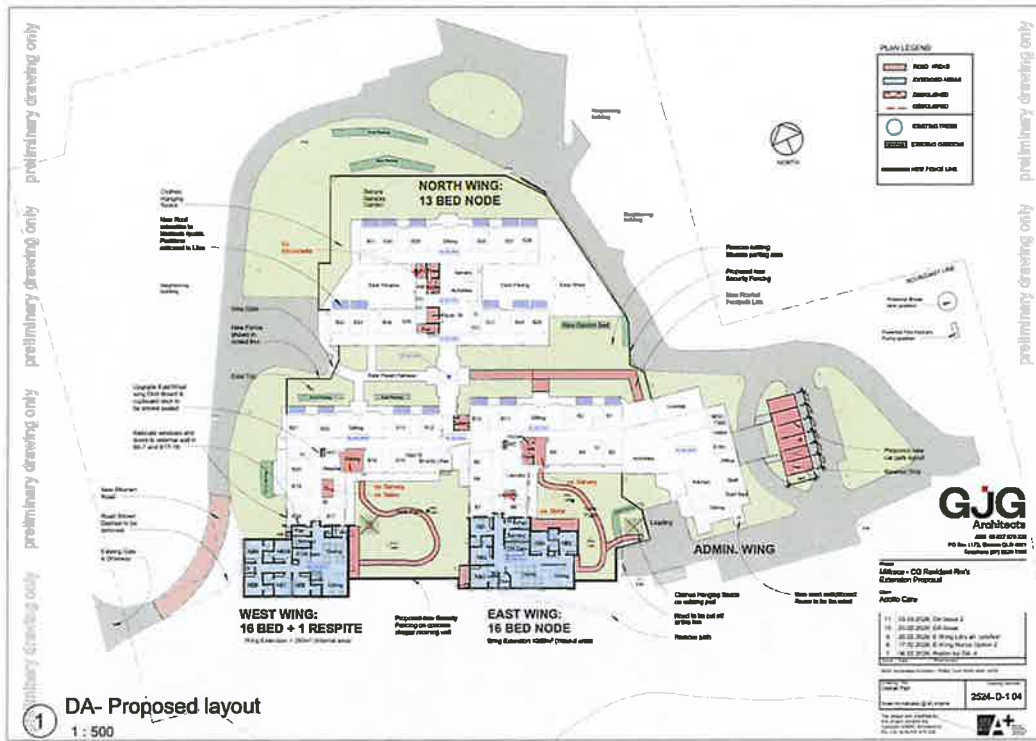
Excerpt of the Overall Plan showing the areas of proposed alterations and additions
